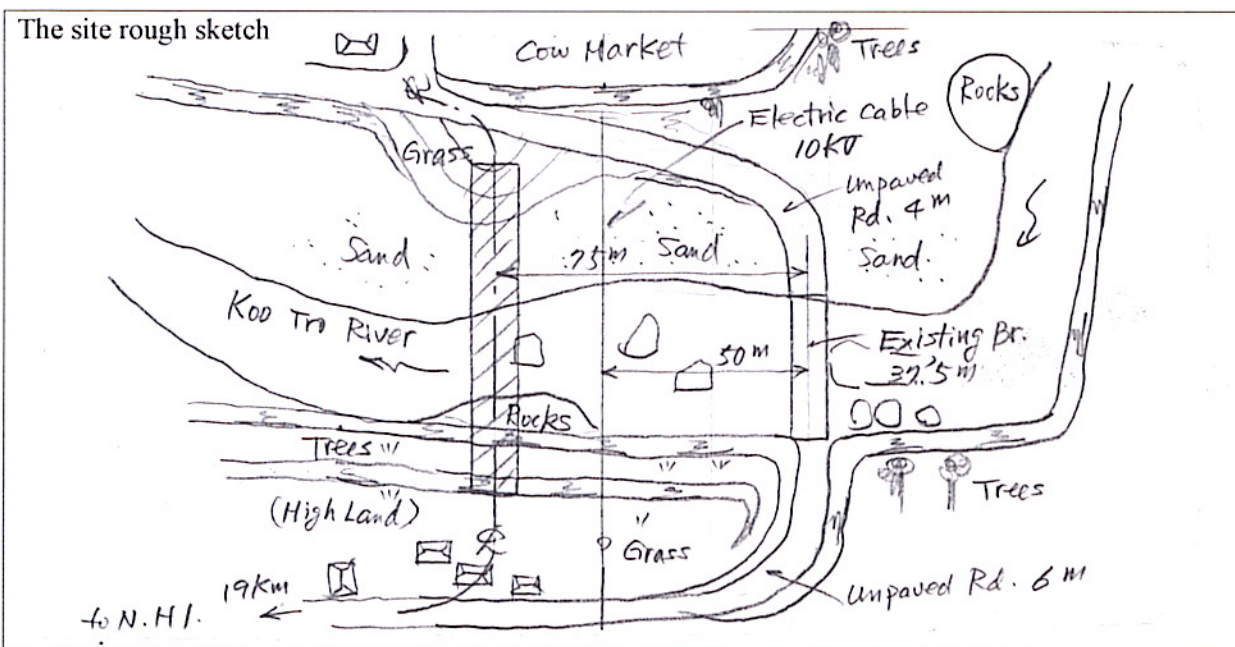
Access road on right bank from NH1 will be made straight. A few houses to be removed.
